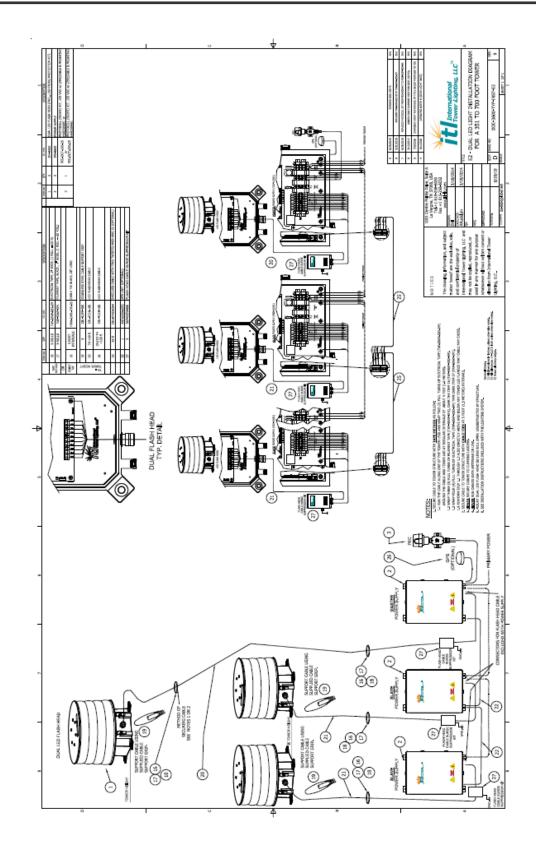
ILS-3600 Triple System Typical Installation Diagram – 700'
